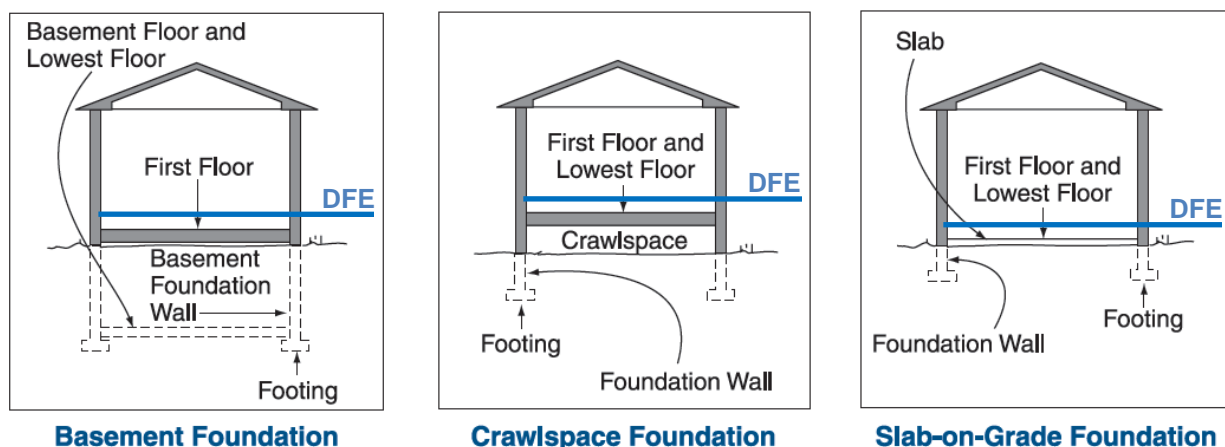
Examples of Flooding Above the Lowest Floor (Source: FEMA P-312)
